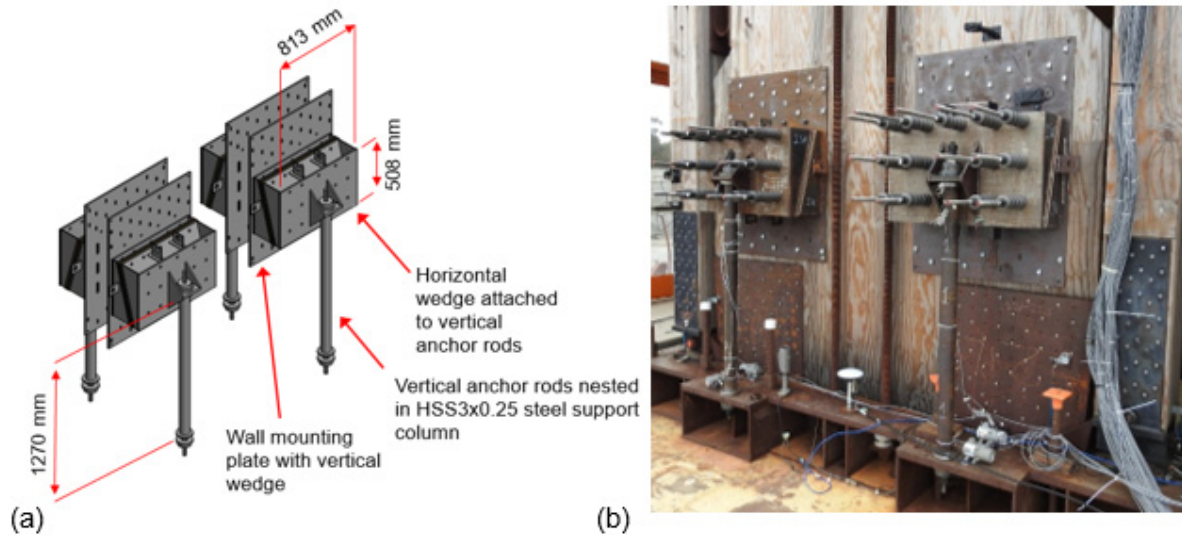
(a) UFD schematic; (b) Installed UFD at West MPP wall
